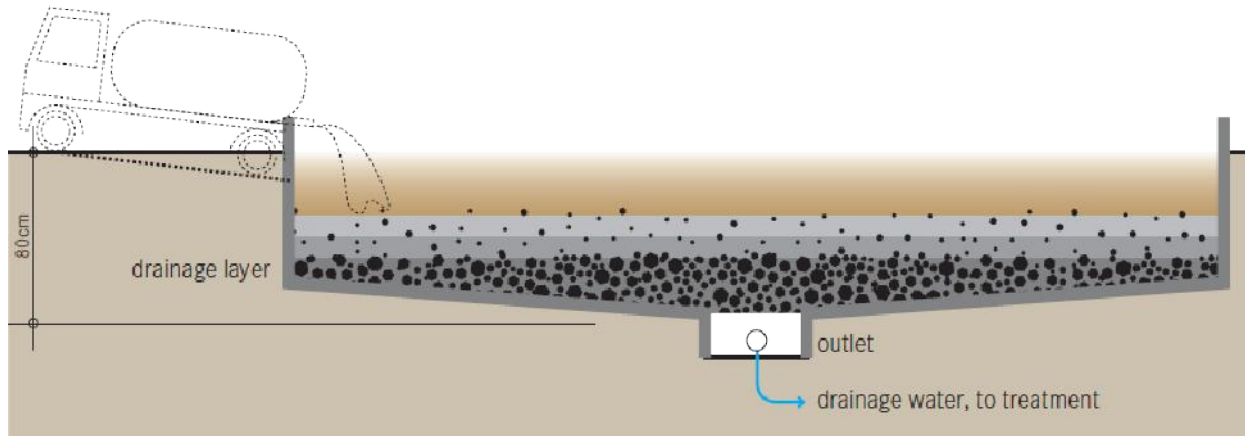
Unplanted dryings beds (EAWAG & WSCC 2008)
